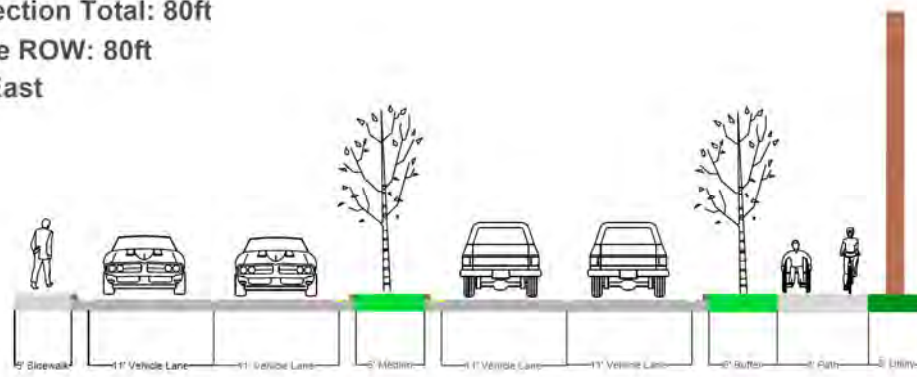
ROUTE 28 CENTERVILLE CROSS-SECTION - OPTION 2E
